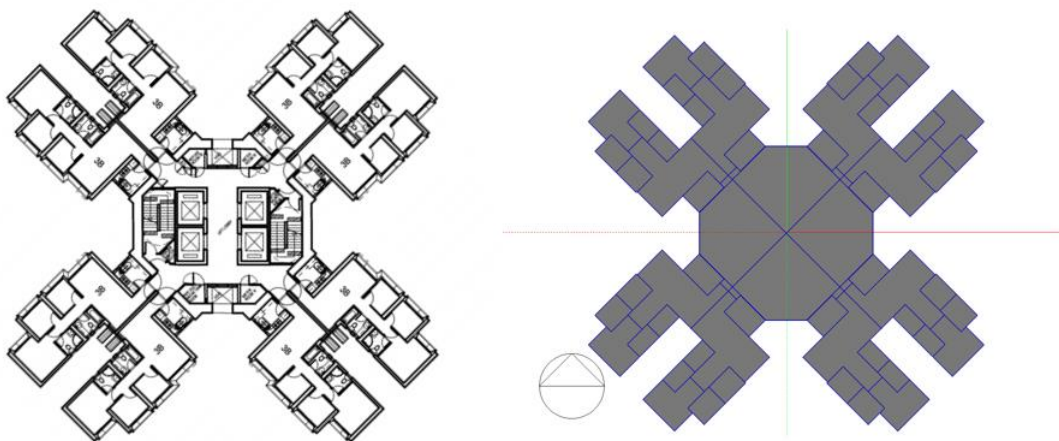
Standard typical floor plans of concord-type public residential building provided by the Hong Kong Housing Authority (left), and the geometry built in Design Builder to facilitate the whole building energy simulation (right)
